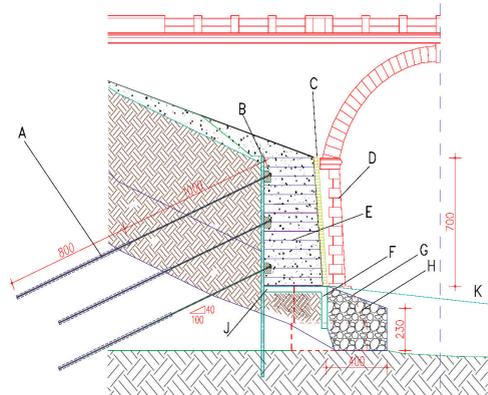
Final layout: (A) steel tendons; (B) micro-piles; (C) concrete block face; (D) bridge abutment; (E) geogrids; (F) front concrete key; (G) scour stone embankment (H) abutment foundation; (J) foundation concrete mat; (K) river bed.
